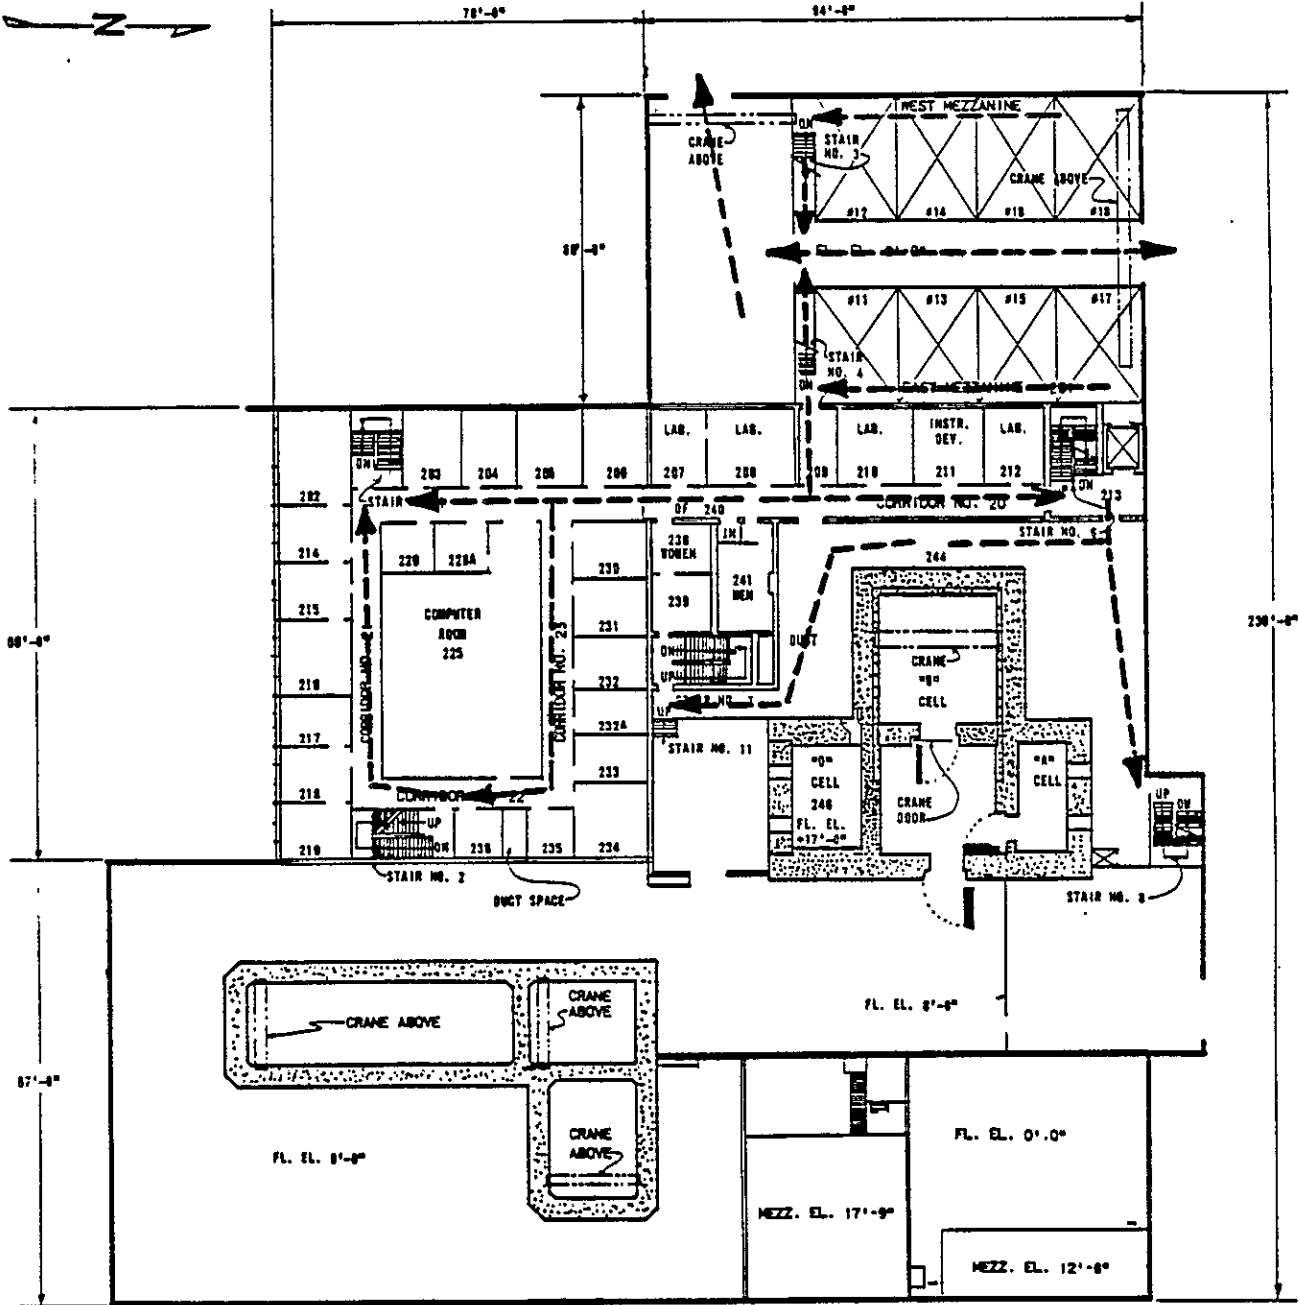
324 Building Evacuation Routes, Second Floor.
